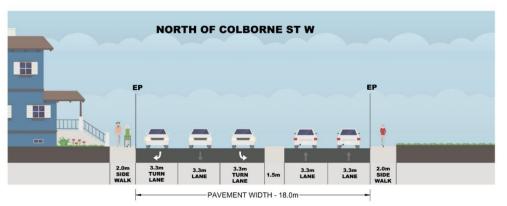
COLBORNE STREET INTERSECTION - ALTERNATIVES (1 THROUGH 3)
